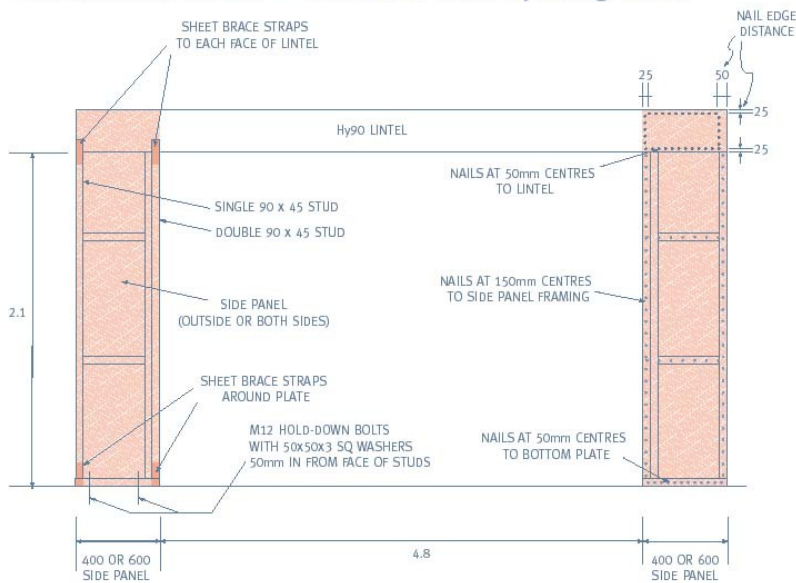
construction details (ref page 18 of Hy90 brochure [6])
